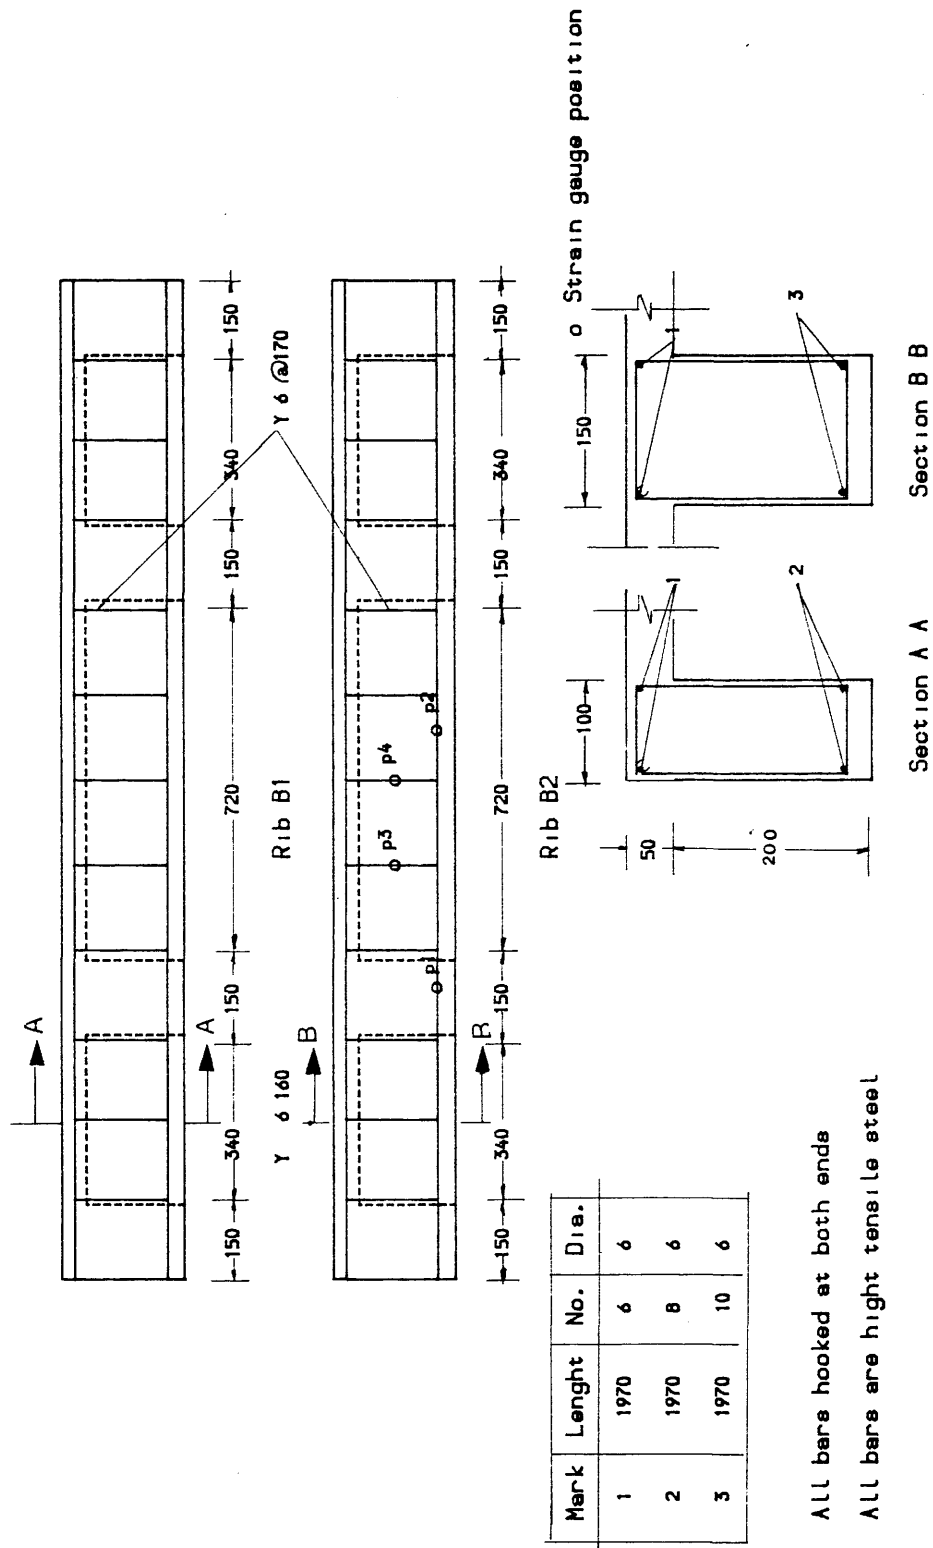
MODEL RIBBED SKEW SLAB NO. 6 Details of the steel and the strain
